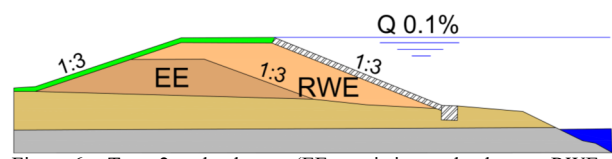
Type 2 embankment (EE – existing embankment, RWE – raised and widened part).
